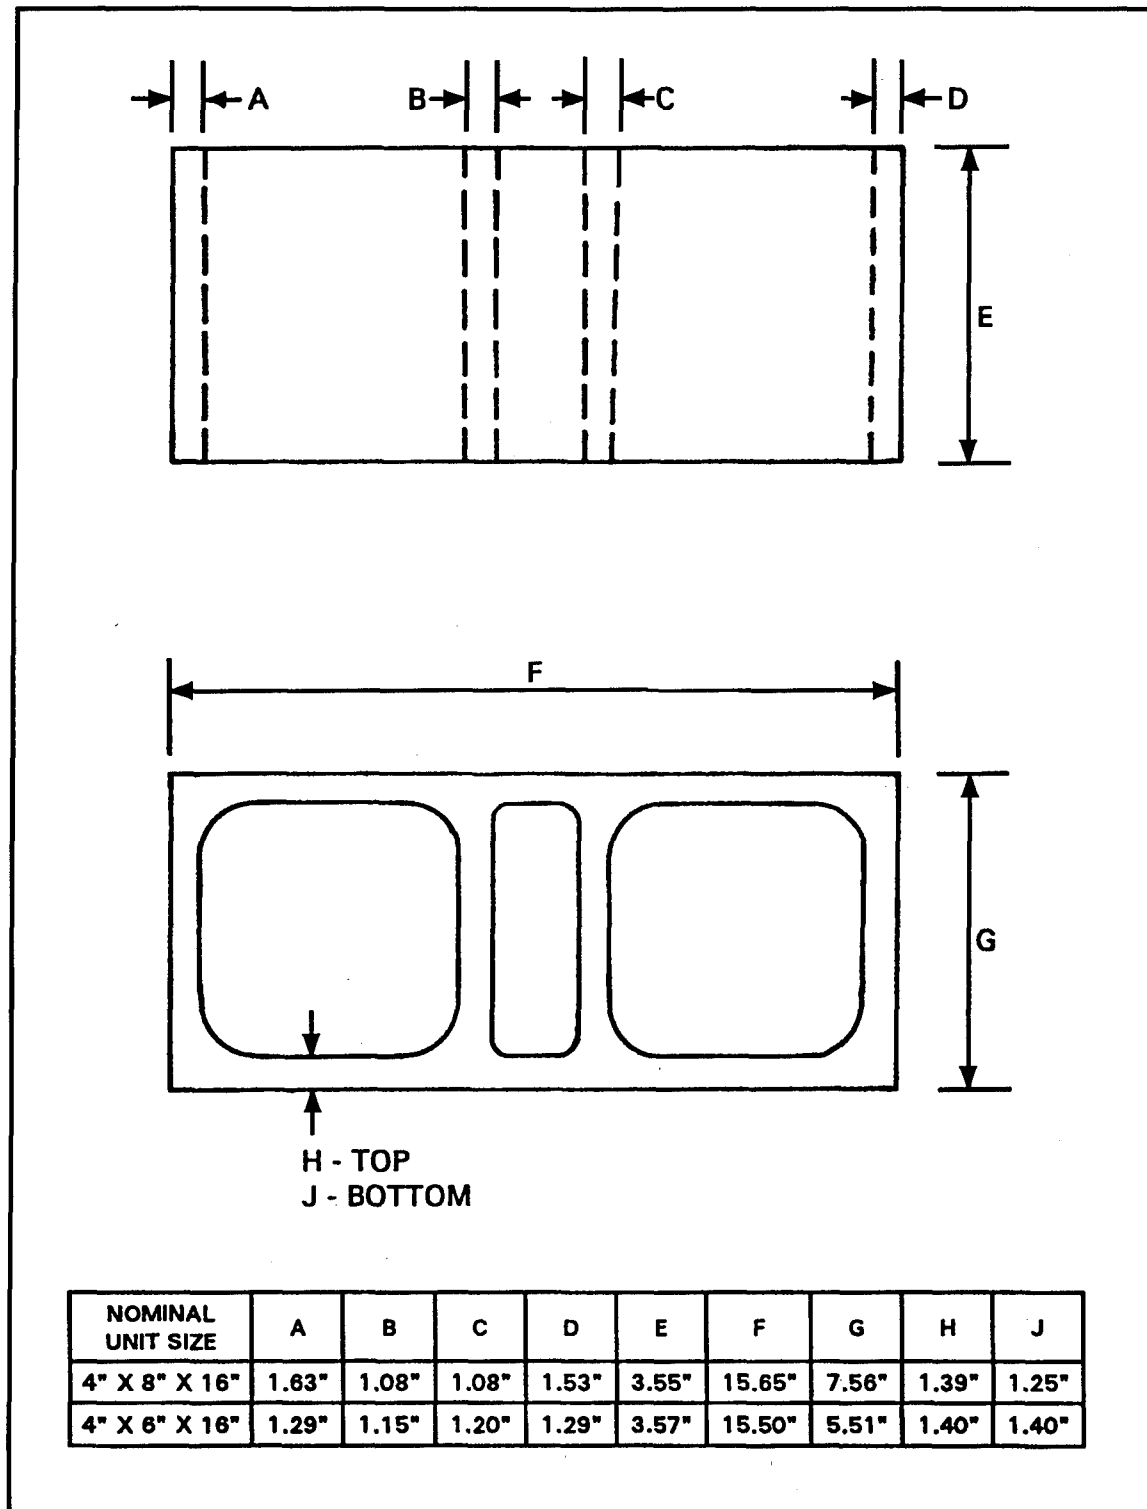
Typical elevation and cross section of 8- and 6-in. clay masonry units
